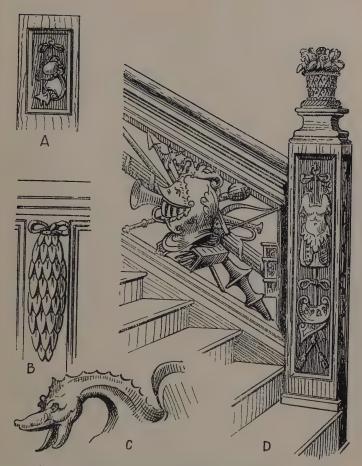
DETAILS FROM THE STAIRCASE AT HAM HOUSE, SURREY.
